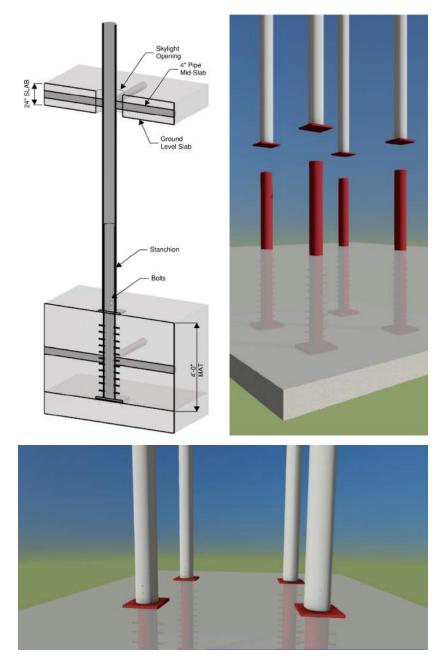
Individual sub-assemblies are secured by anchoring to prepositioned stanchions at their base
